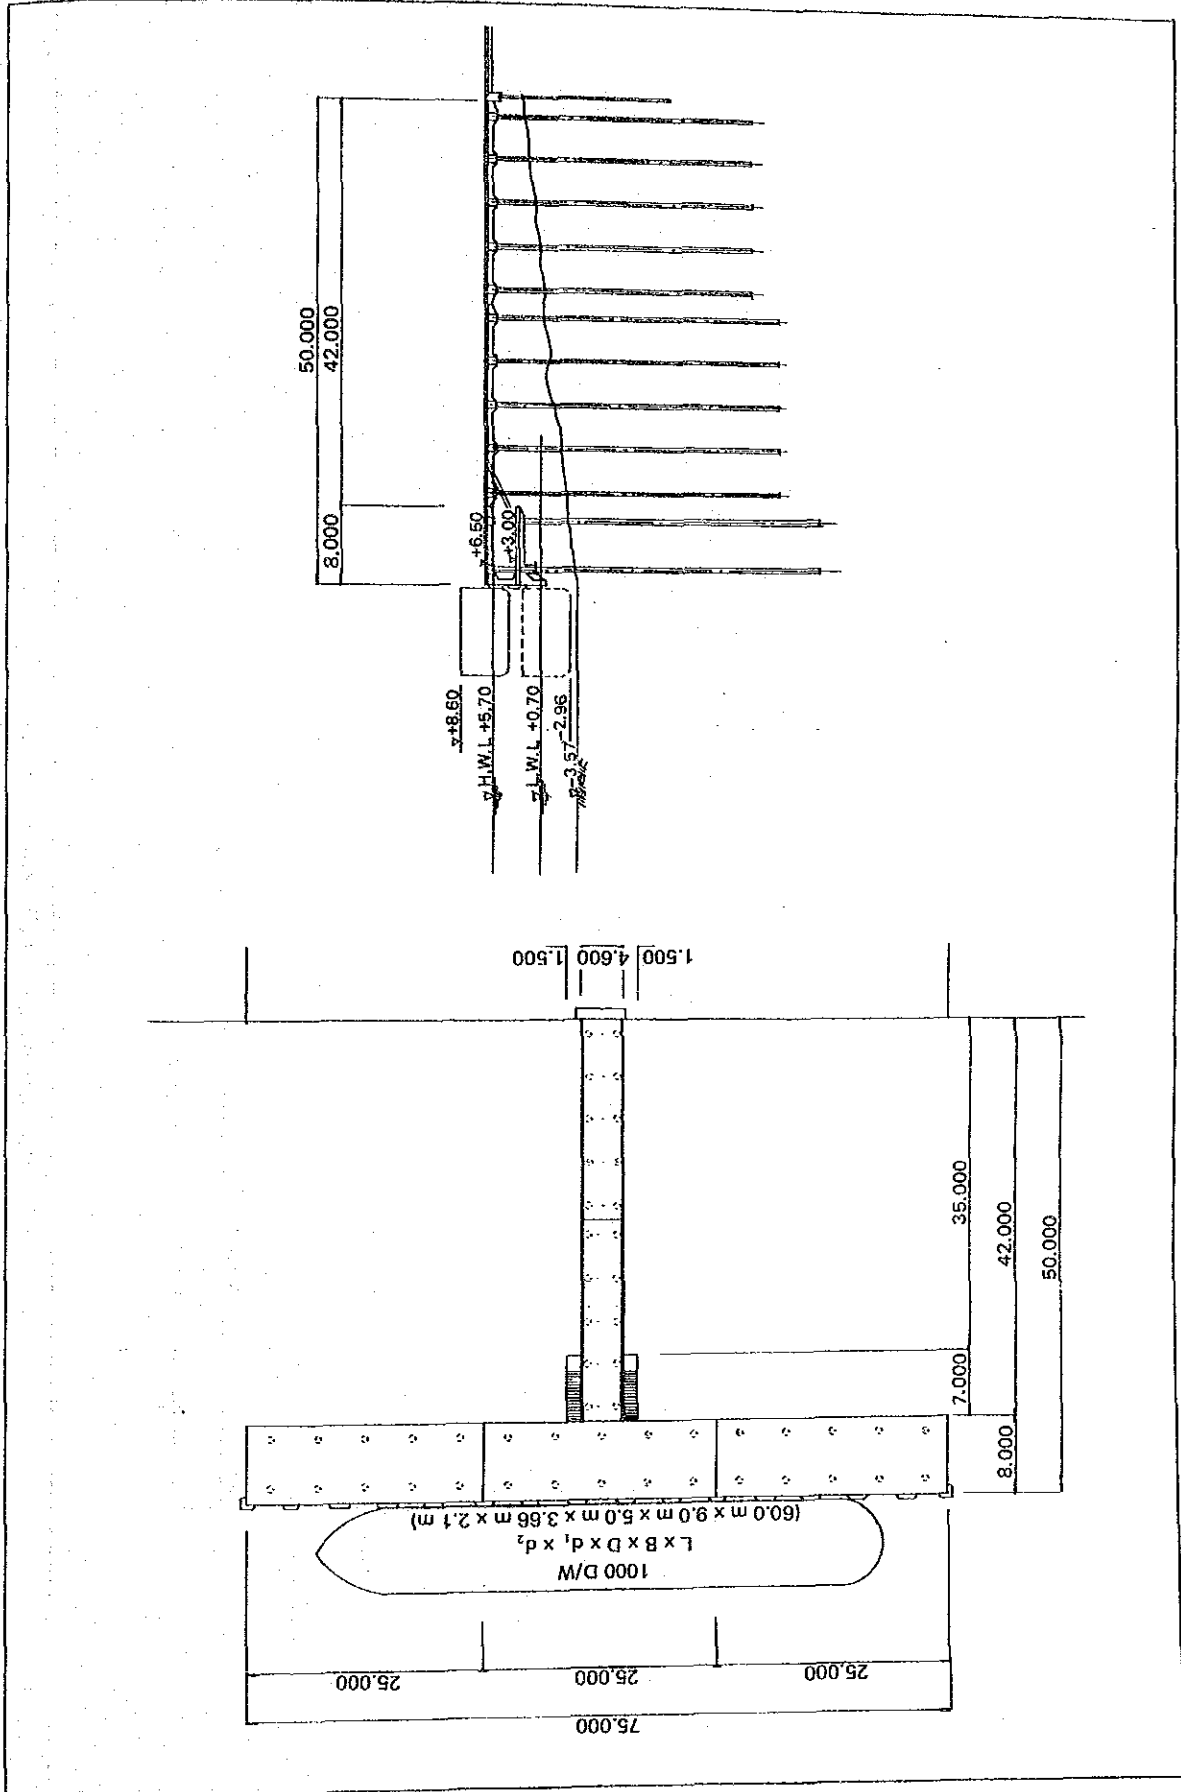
Open-Type Jetty for Cargo Terminal Improved Mooring Facilities
